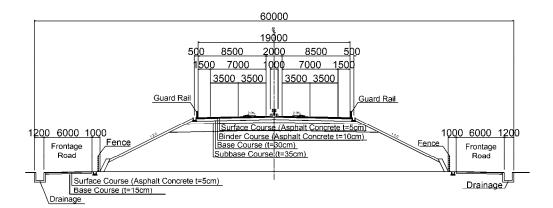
Typical Cross Section of Embankment (Approach Road)
